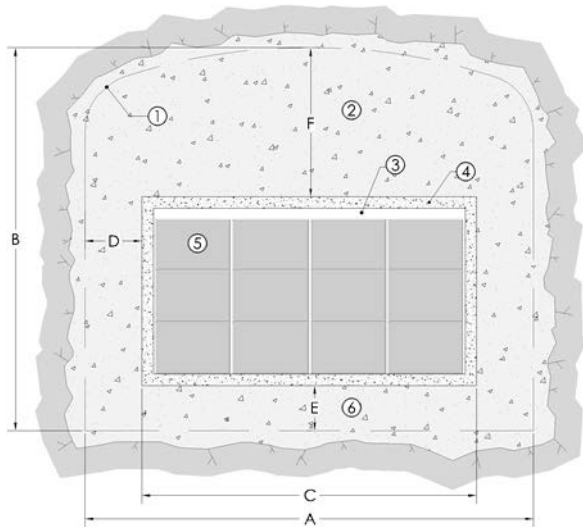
Schematic cross-sectional layout of the BHK vault for metallic waste (from Elfving et al. 2013). Legend: 1.) Theoretical tunnel contour. 2) Concrete backfill. 3) Grout. 4) Concrete structure. (0.5 m). 5) Steel tanks. 6) Concrete. Approximated dimensions: $A = 20.6$ m, $B = 19.6$ m, $C = 15$ m, $D = 2.8$ m, $E = 2.4$ m, $F = 8.8$ m.
